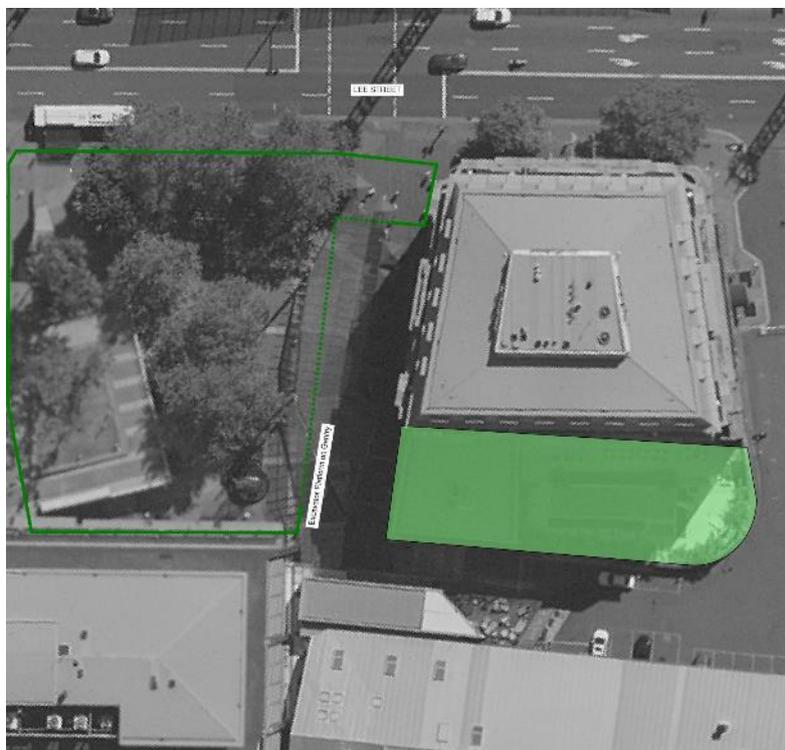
Plan view of leisure deck demolition works shown in green.
